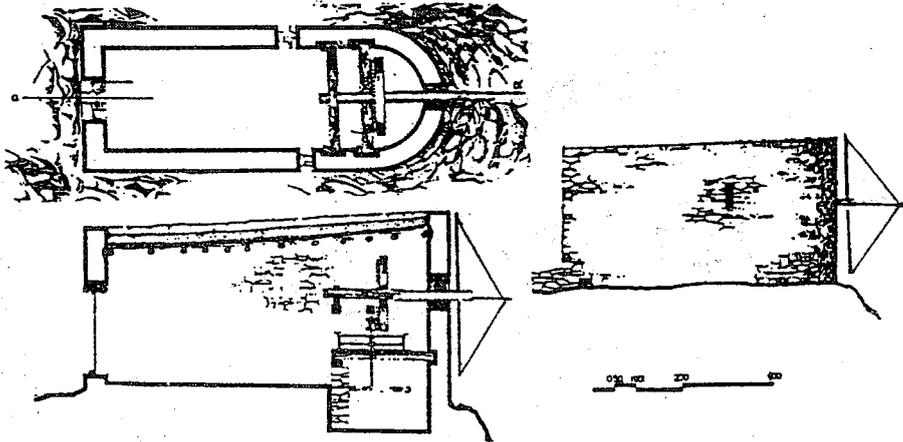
Plan, elevation and cross-section of a typical Cretan 'fixed mill'.
